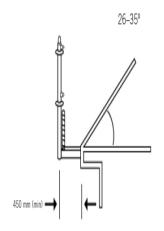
Roofs with pitch between 25 and 35 degrees require a two-plank platform guardrail system (end guardrail omitted for clarity)
